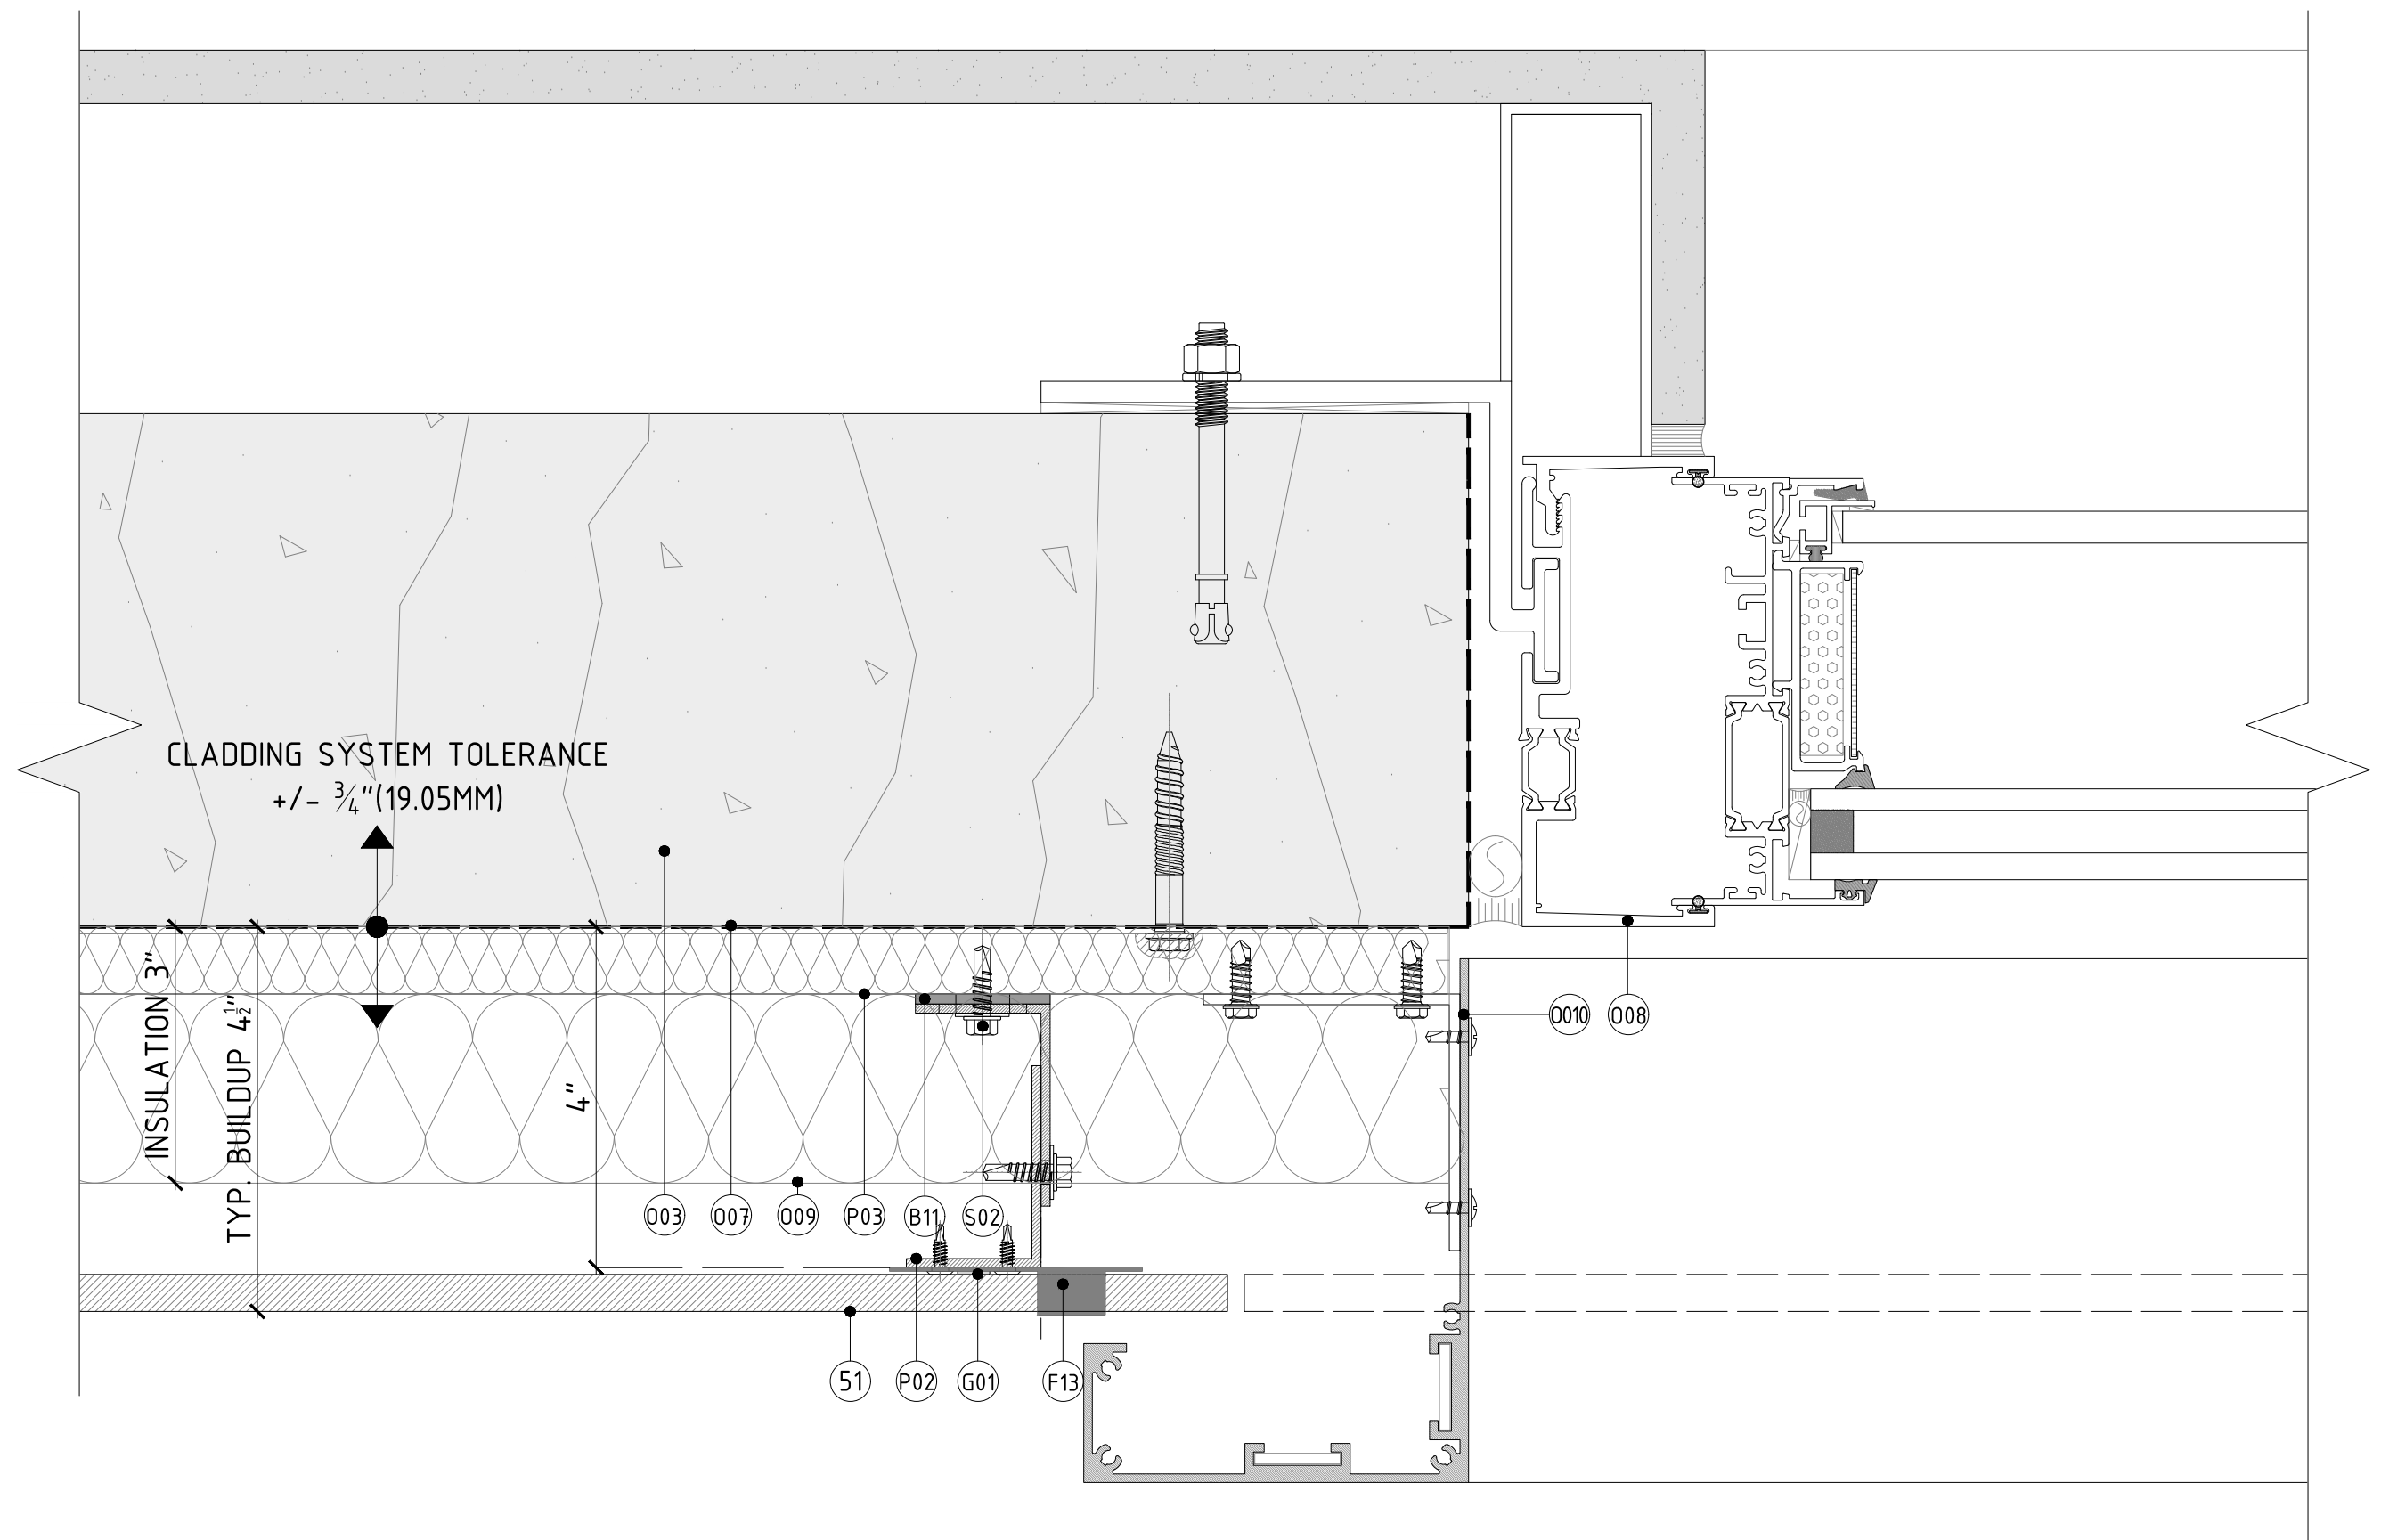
DETAIL B - TYP. METAL JAMB DETAIL - 221W 17TH ST
